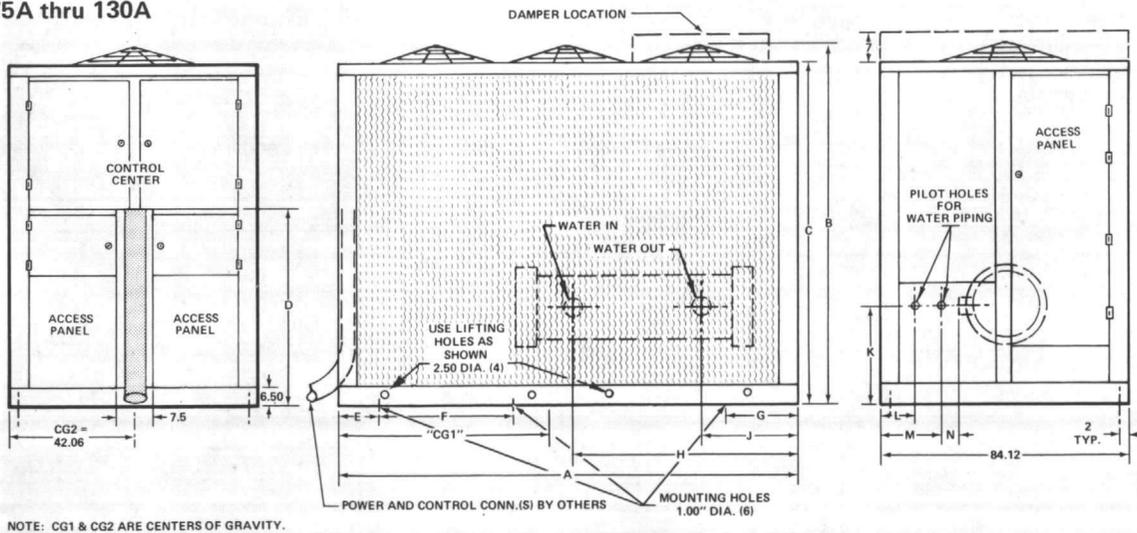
ALR DIMENSIONAL DRAWINGS
